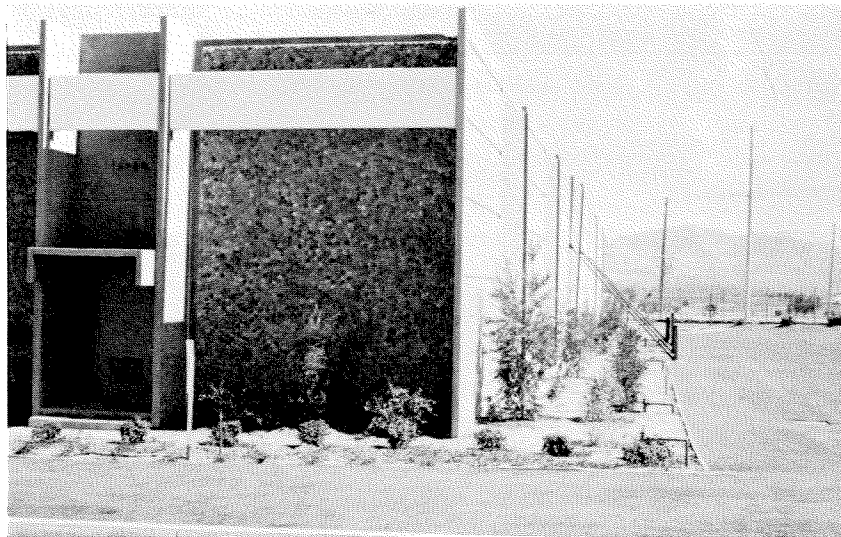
Walls of Balboa Blvd. switchyard are braced following the earthquake.
